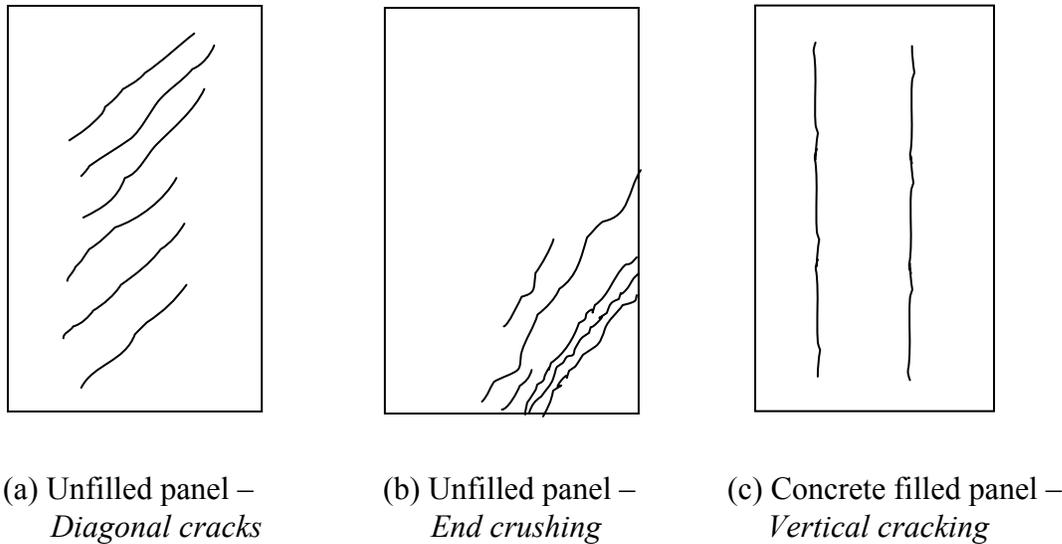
Typical failure modes for GFRG wall panels subjected to shear
